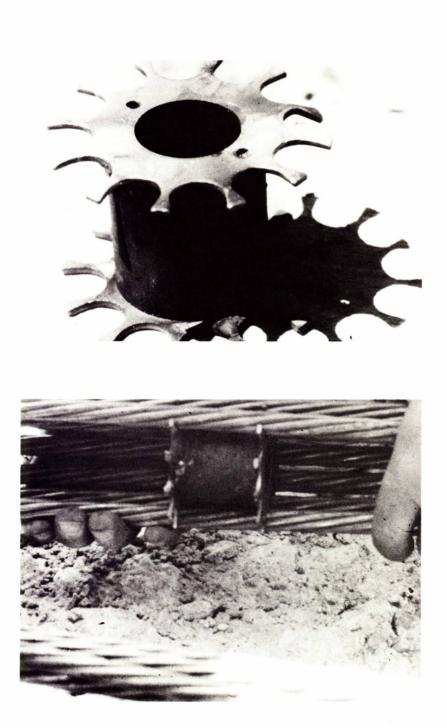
Spacers for assembling rock anchors. A spacer, shown in the upper photograph, keeps strands separate as shown in the lower photograph. Wire or steel strapping holds the strands firmly on the spacer.
